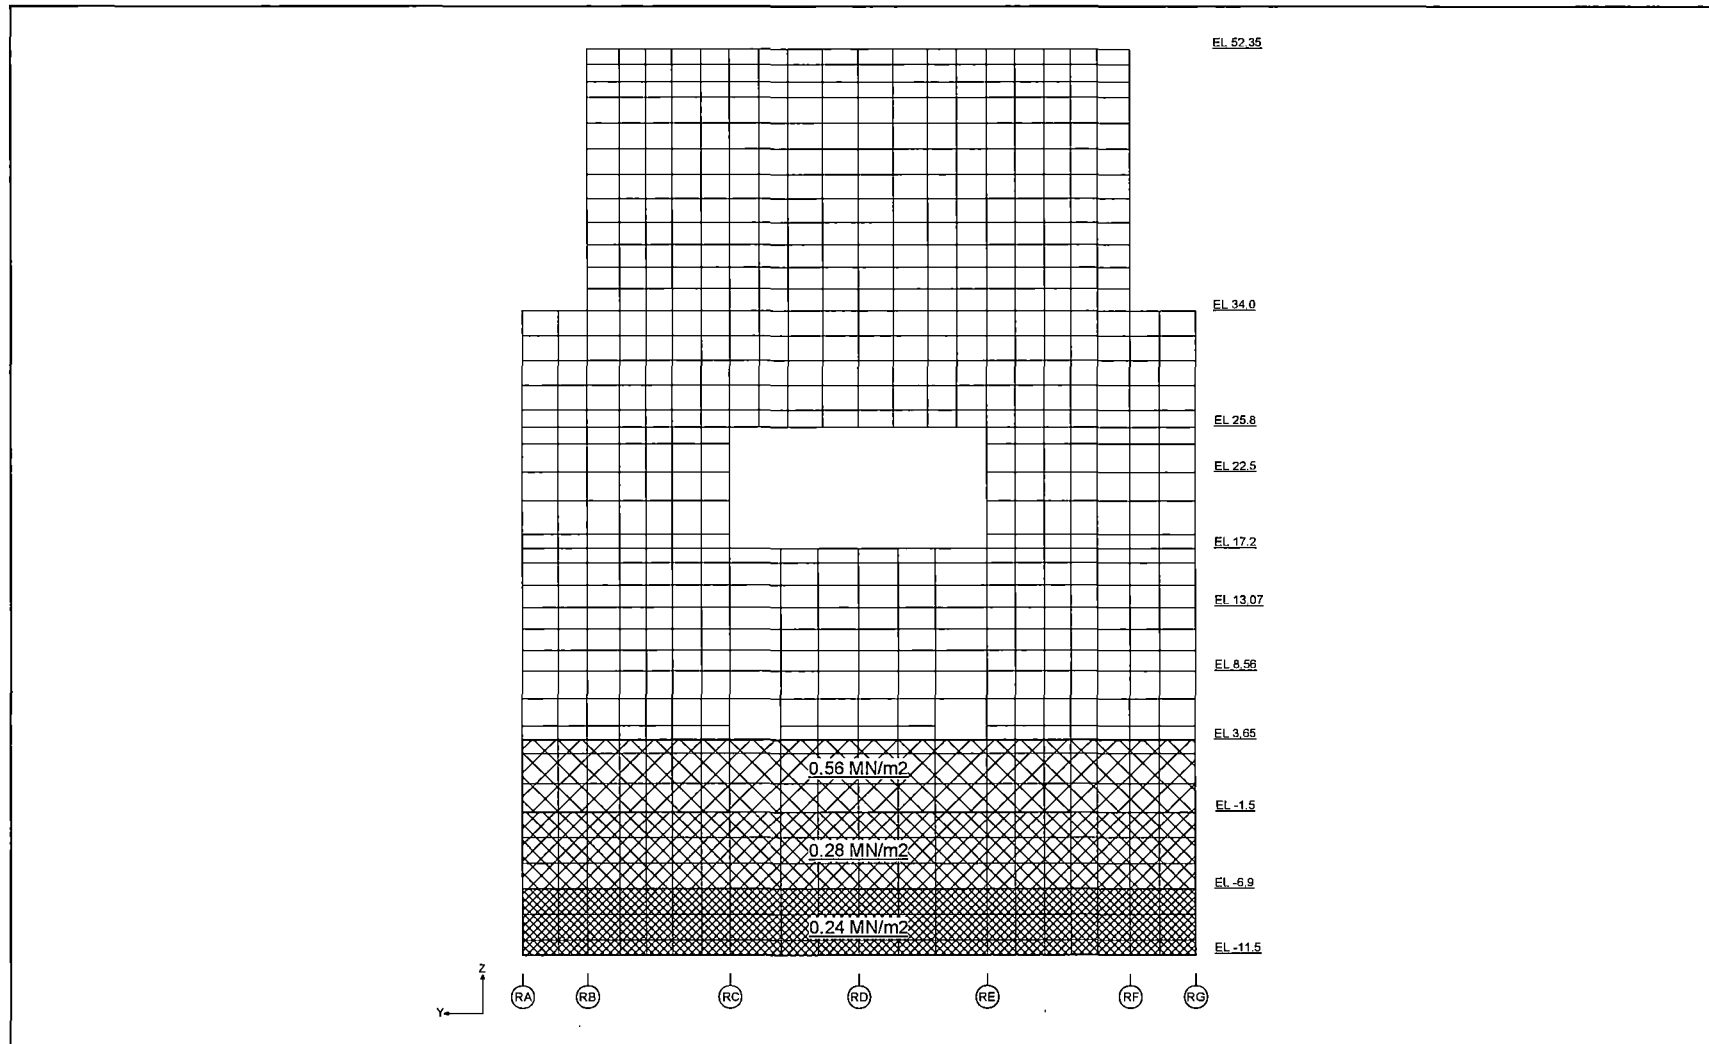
Soil Pressure Due to N-S Direction Earthquake on the External Wall (R1 Column Line)
